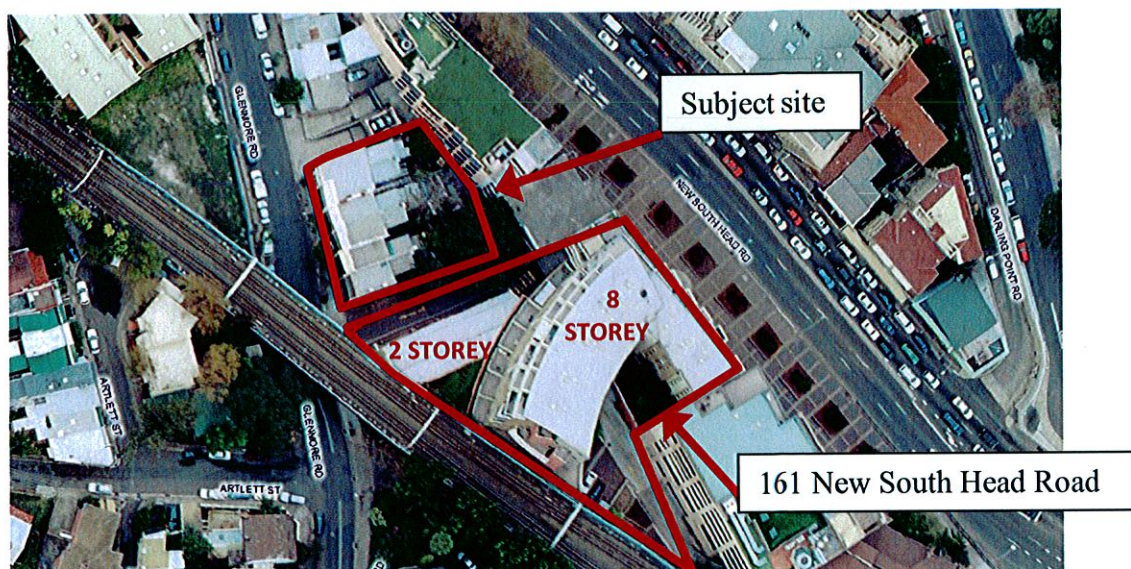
Location of the subject site in relation to the adjoining building at 161 New South Head Road
